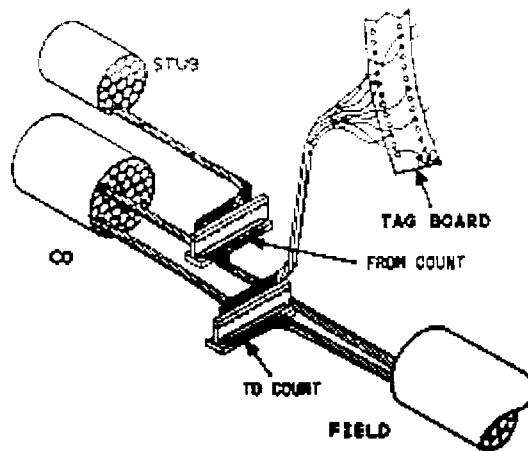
Place Half-Tap Module on 25 Pair of Stub Cable
